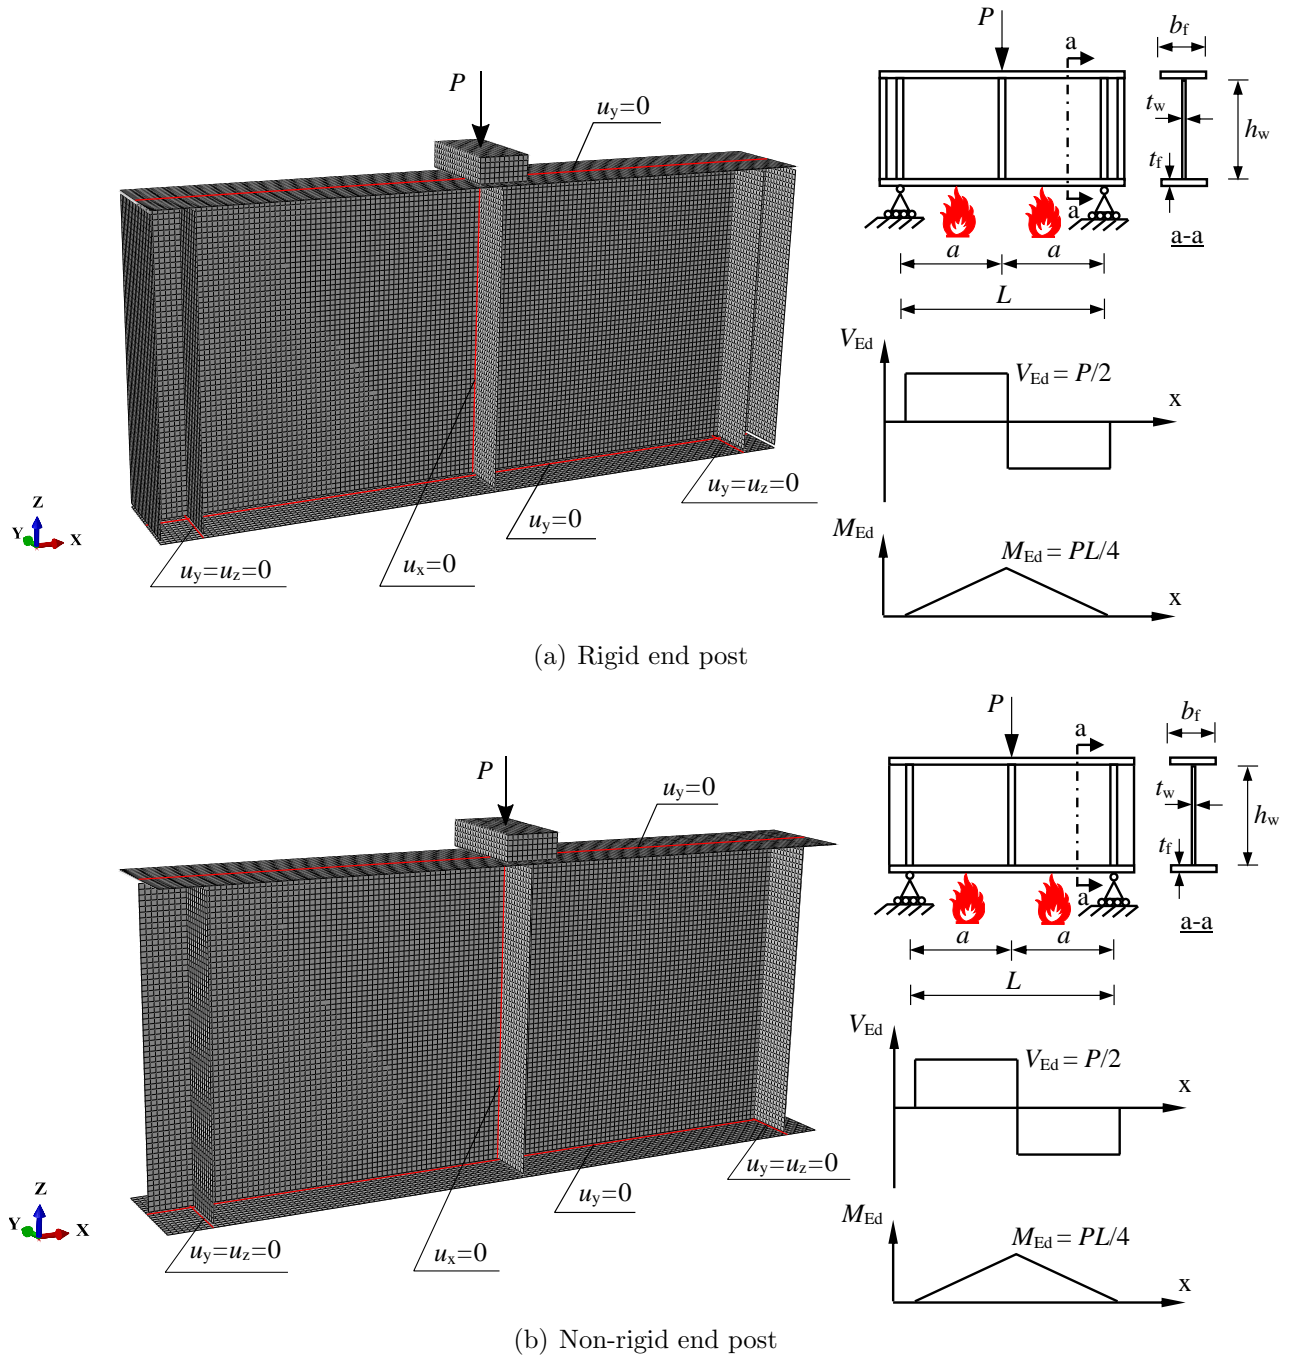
Boundary and loading conditions of the finite element model of stainless steel plate girders
